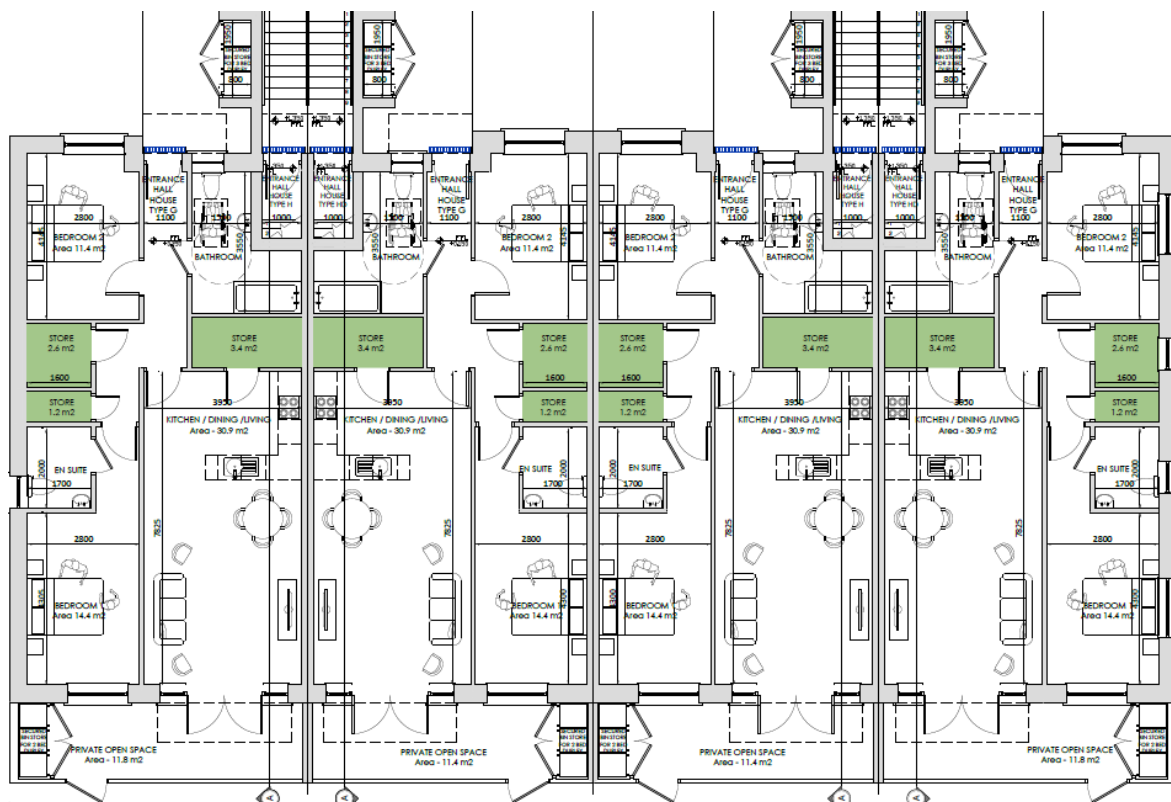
Proposed ground floor plan of Duplex Apartment Blocks A, E, H, I & K.
